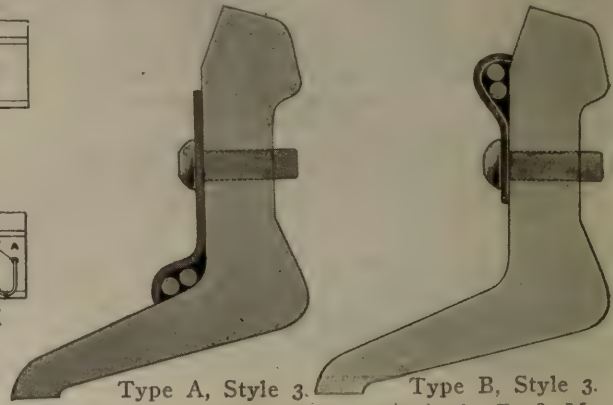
Bond Wire Outside of Splice Bar; Fastened by Rivets.
